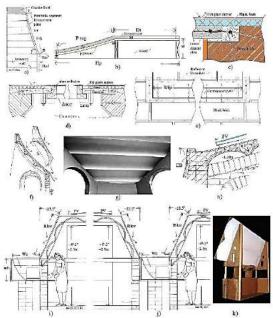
TRW Construction Ferrocement Studies: a) section at CPC shape ferrocement wall; b) CPC shape ferrocement wall panel mold; c) Glue laminated glass mirrors or glass mirrors glued to thin rigid foam glued to masonry with cement plaster; d-e) ferrocement panel details at masonry wall and cookware door; f-k) TRW kitchen building structure studies with ferrocement channels.
